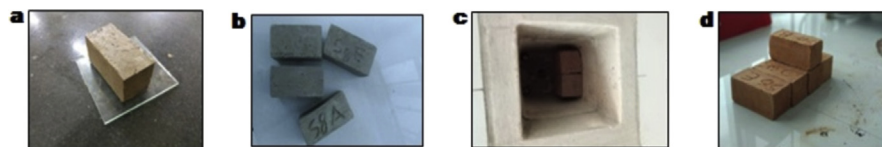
(a) Raw brick (b) Sun dried brick (c) Brick in muffle furnace (d) Fired brick.
